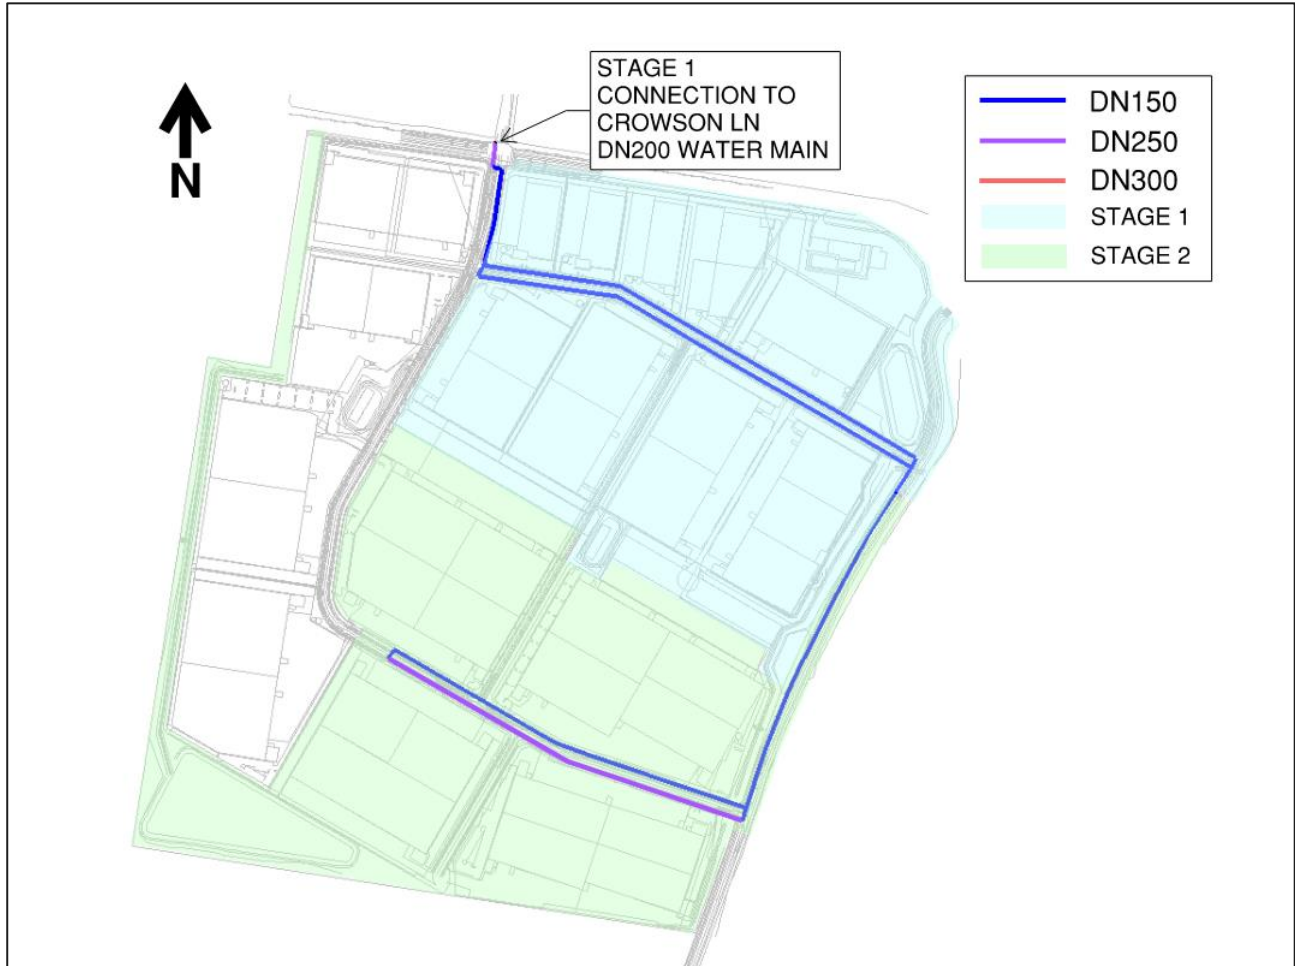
Alternative Supply Arrangement – Crowson Lane Only Internal Water Network Layout
